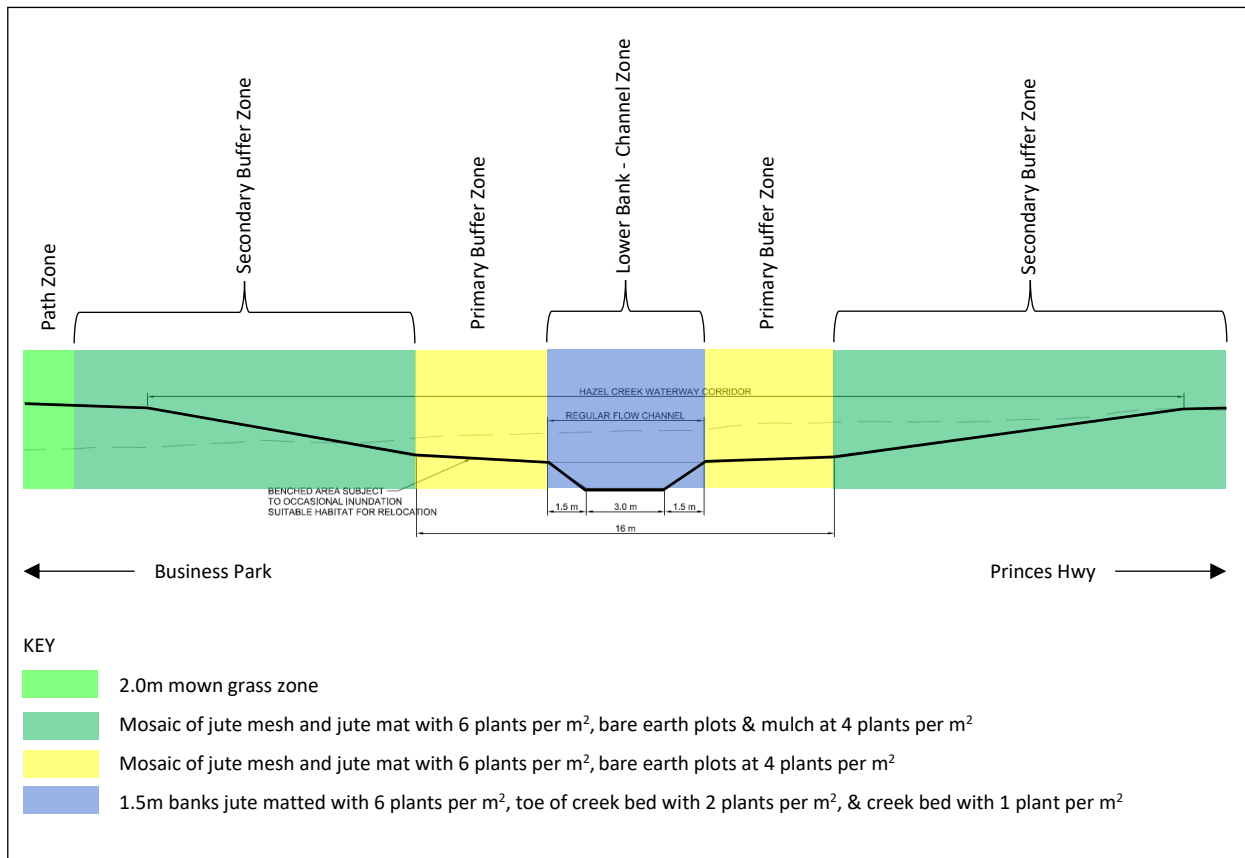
Typical cross-section of the realigned Hazel Creek noting the different zones to be planted.
